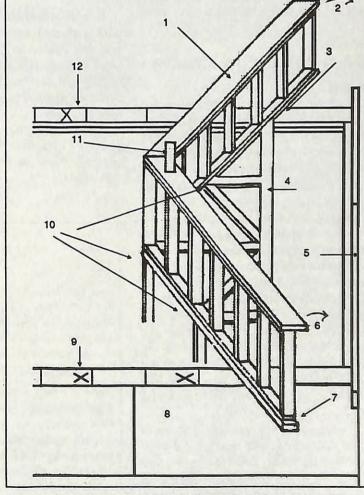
LADDERS ARE NAILED TO FIRST TRUSS AND HINGED OVER GABLE END.
